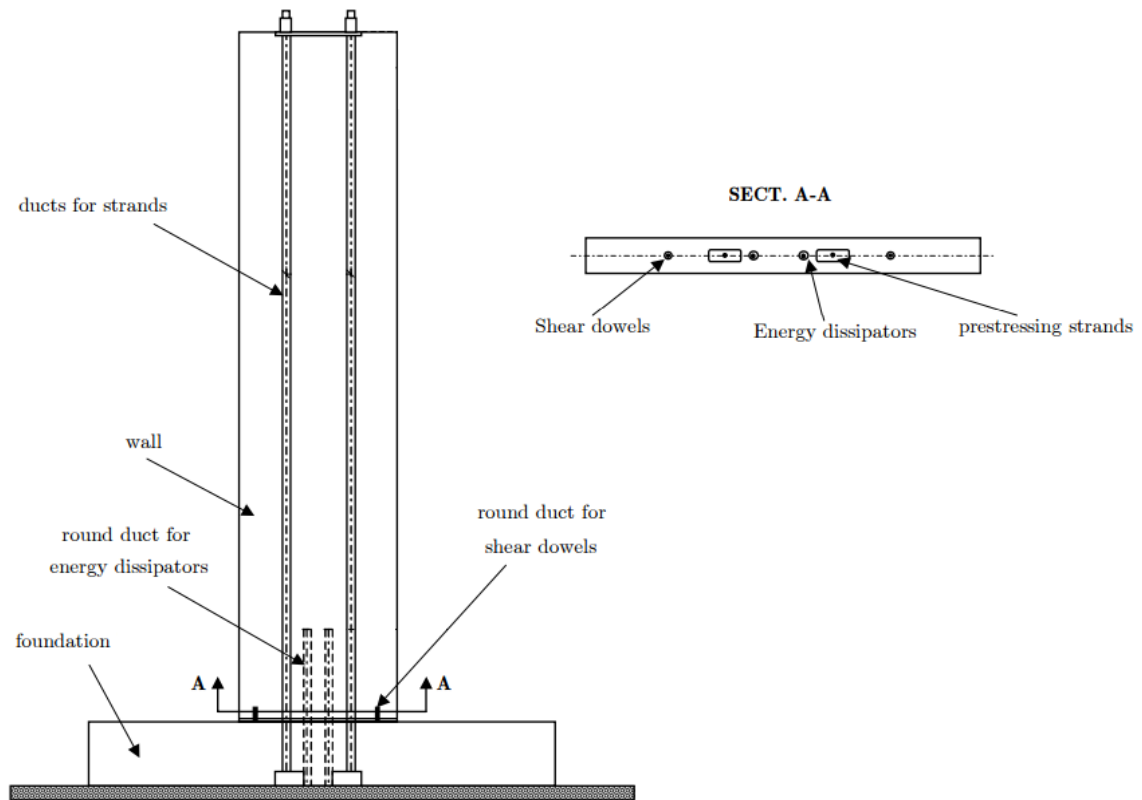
Sample schematic drawing of rocking wall (adapted from Palermo et al. (2005))
